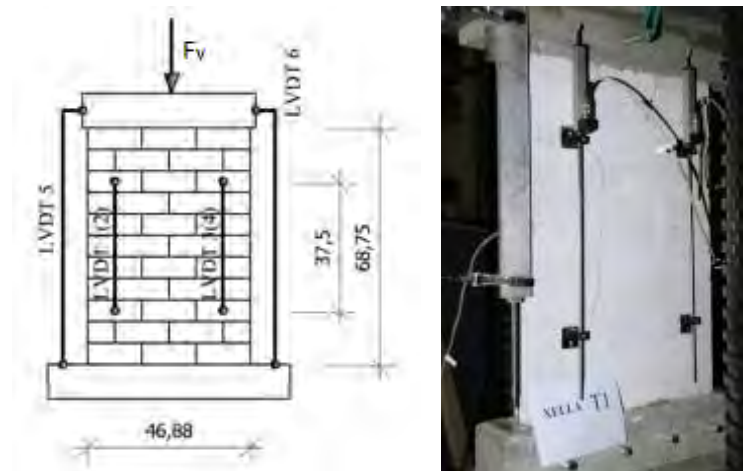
Dimensions and instrumentation of specimens for compression test (left); typical model wall at the end of compression test [55].
